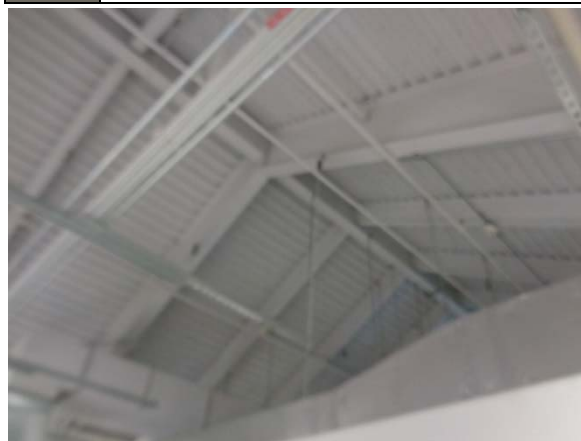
STRUCTURAL STEEL FRAMING AND ROOF DECKING
